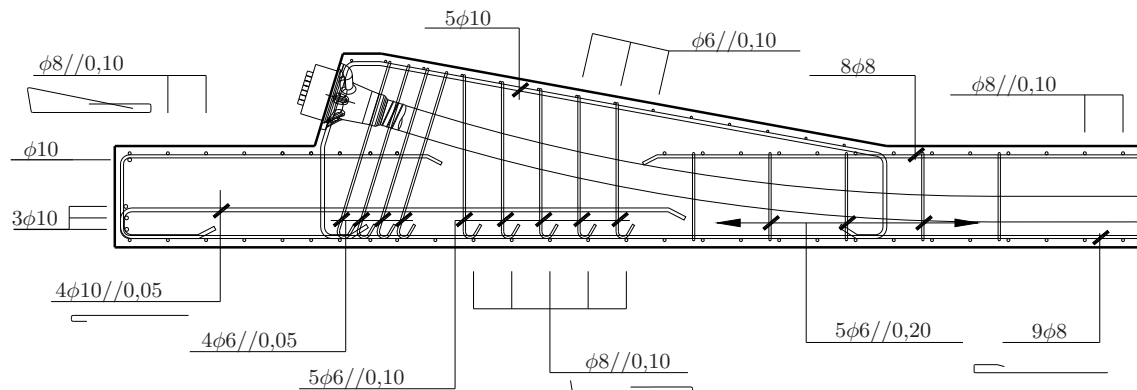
Reinforcement in the blister anchorage zone for tendon A
